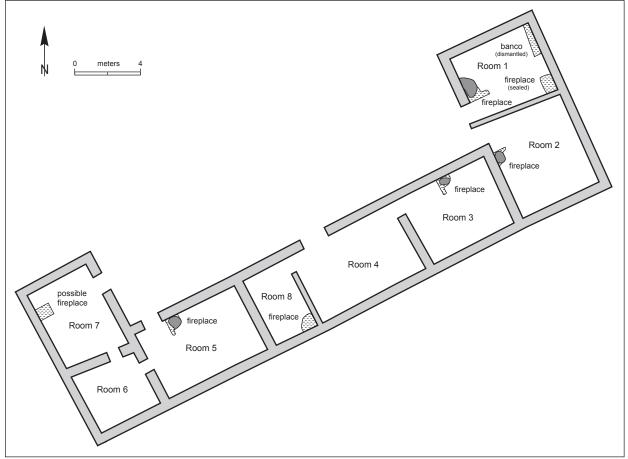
Plan of Structure 1 at the Trujillo House.
